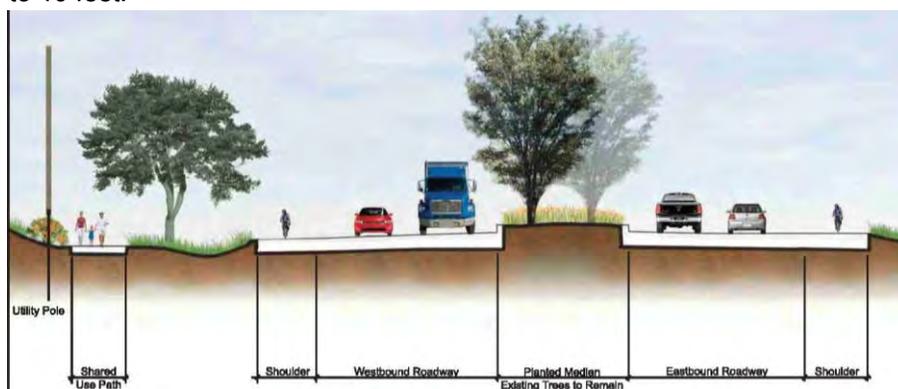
Alternative 2 Base Improvement Segment B Typical Section
